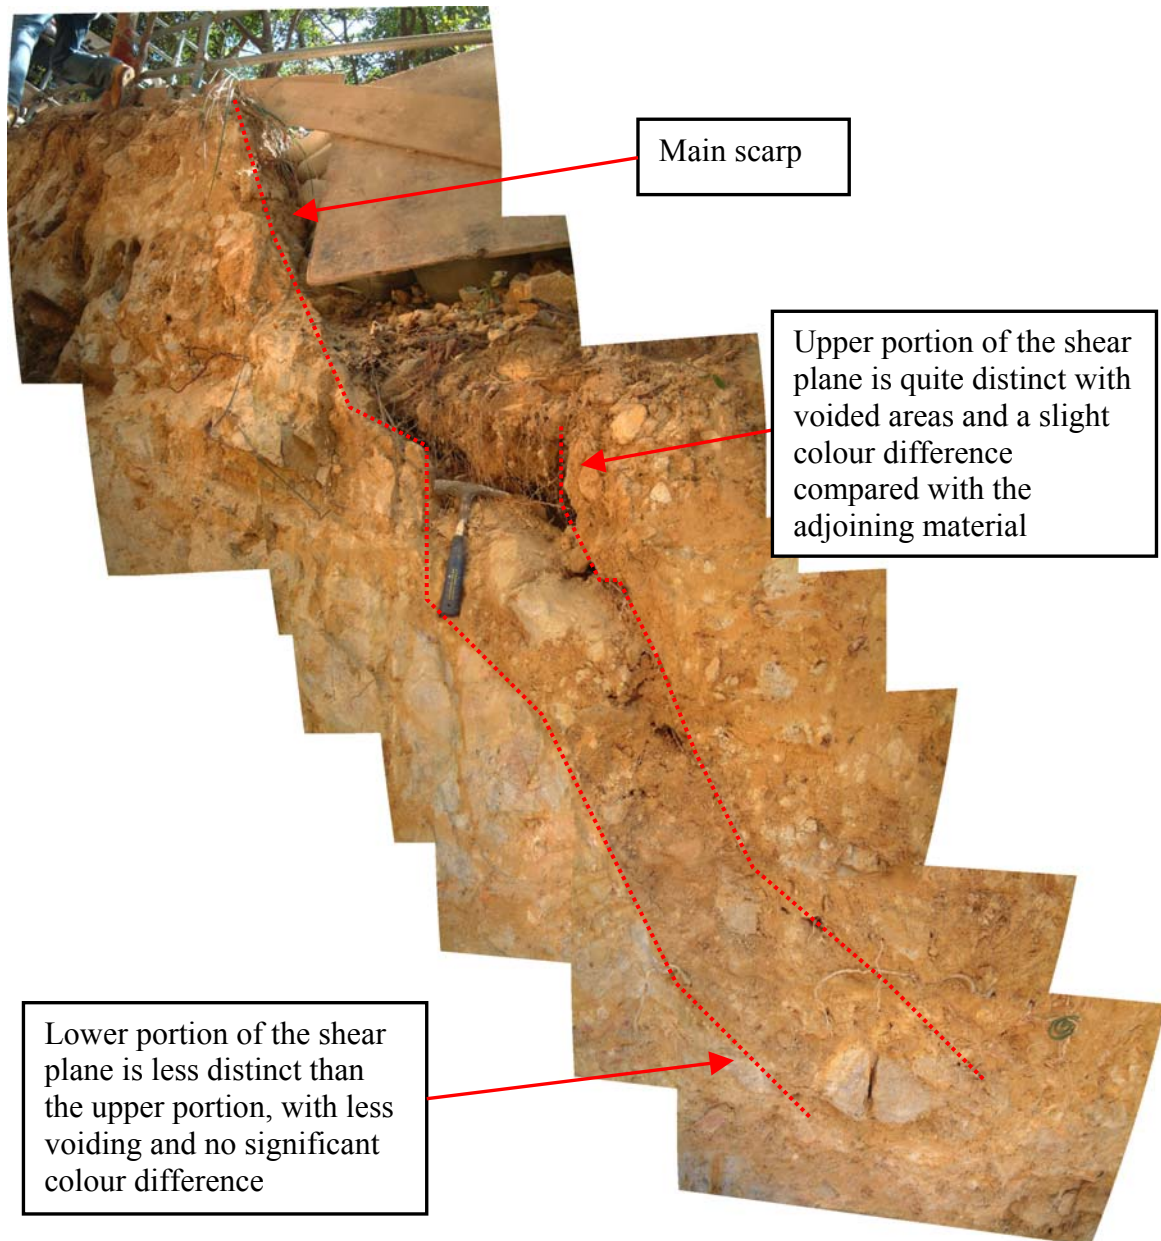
View of Shear Plane Exposed in Face B of Trial Trench TT1
